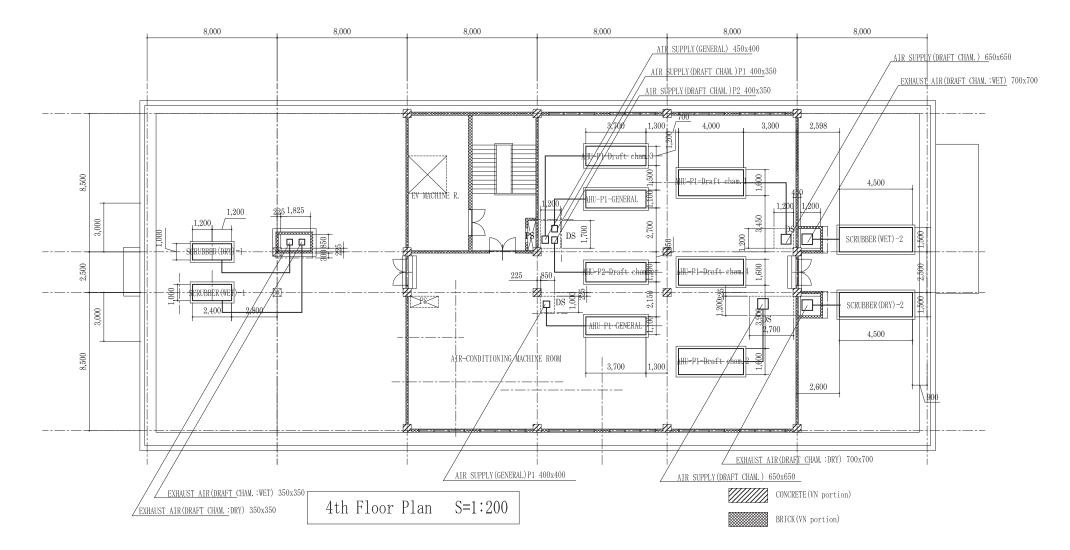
RETAQ center Reference Test Building: 4th Floor plan
